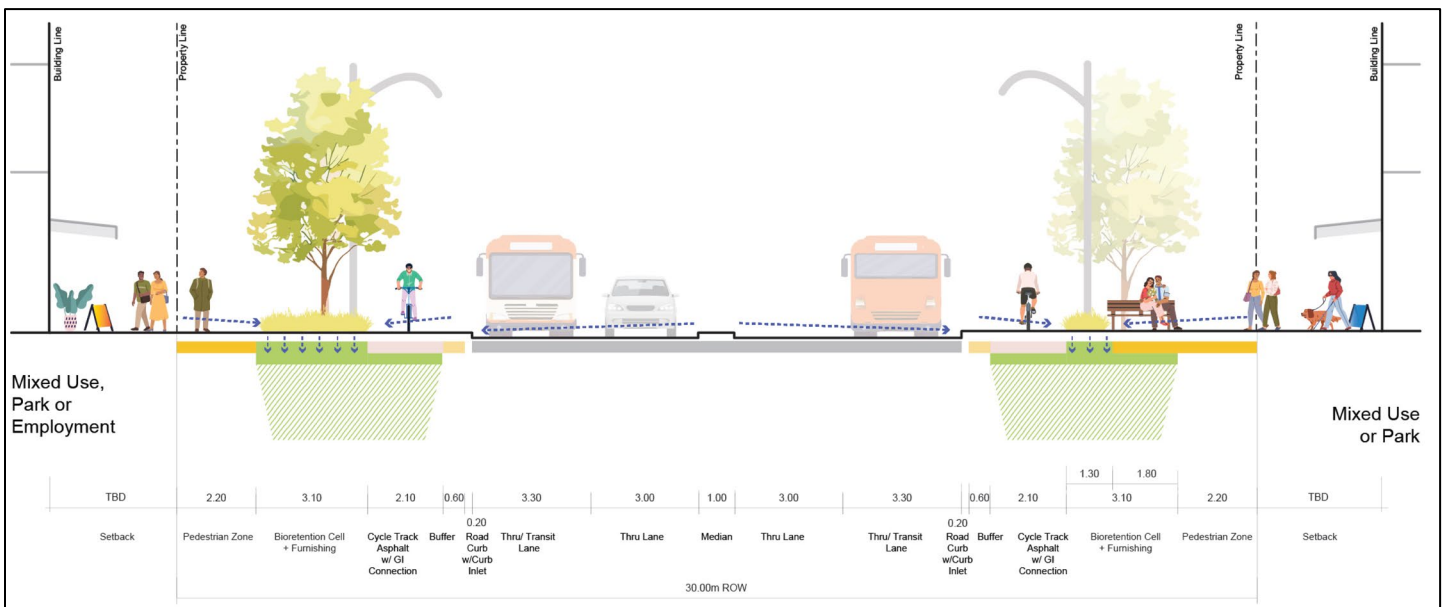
Dufferin Street (Beffort Road to Northern Street) Cross-Section - Option 4
